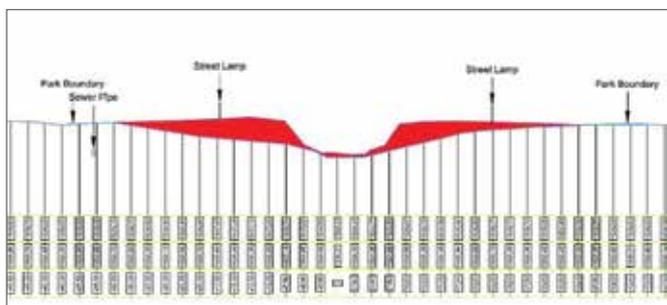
Sample cross section of the canal area – the red shading shows the extent of the bulk excavation to increase conveyance
